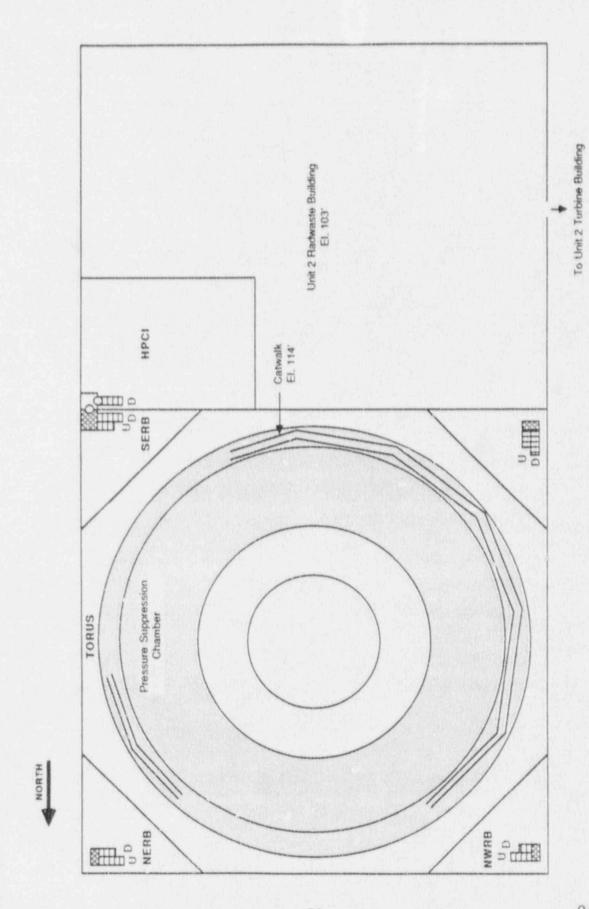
Hatch Unit 2 Reactor Building - Elevations 107 to 111 ft.
